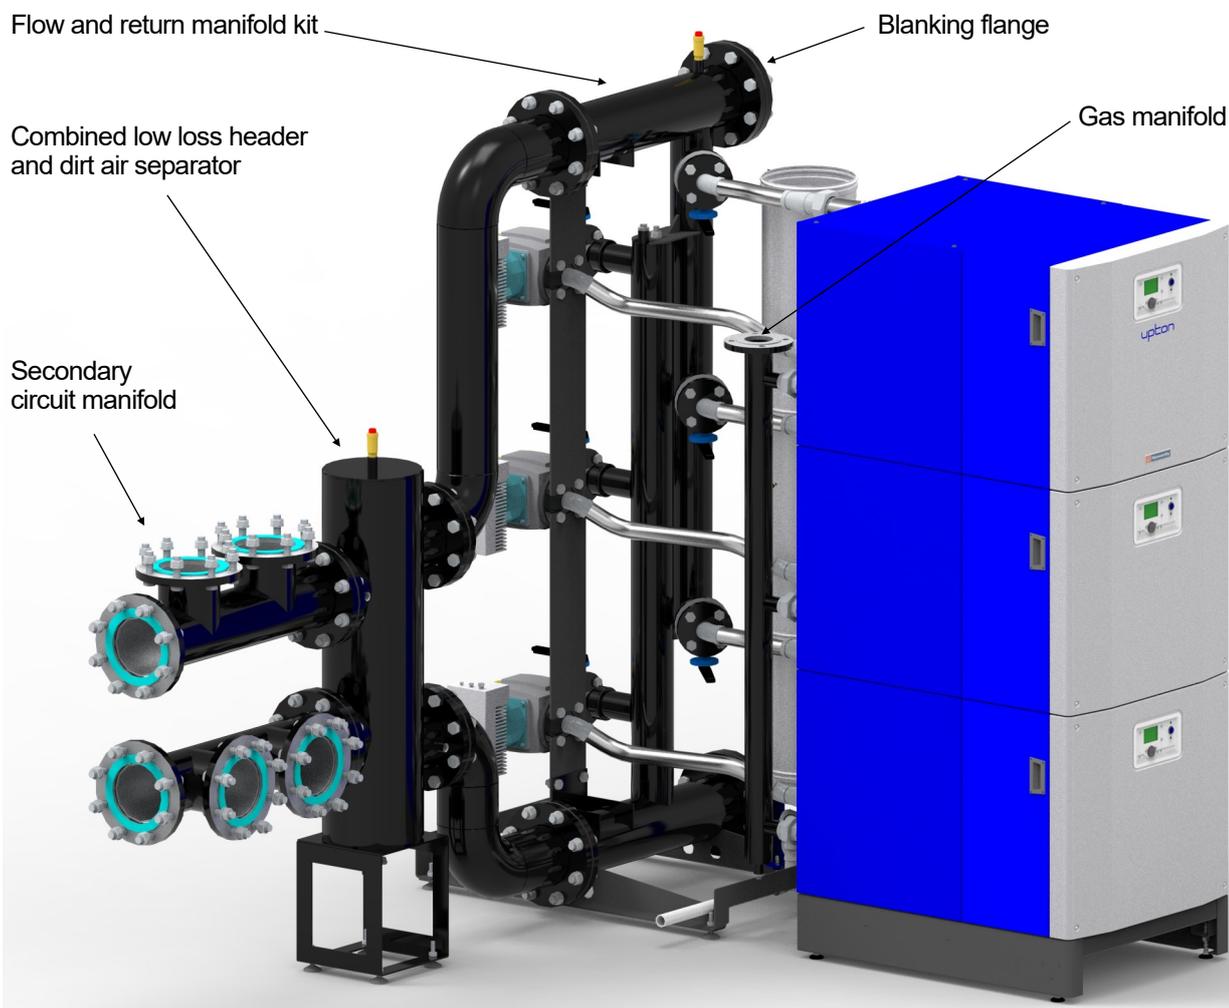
Primary circuit and Gas manifold pipe kit
